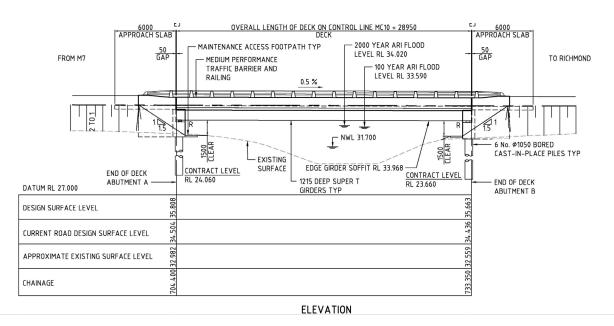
Long section of the proposed Bells Creek bridge (indicative concept design)
